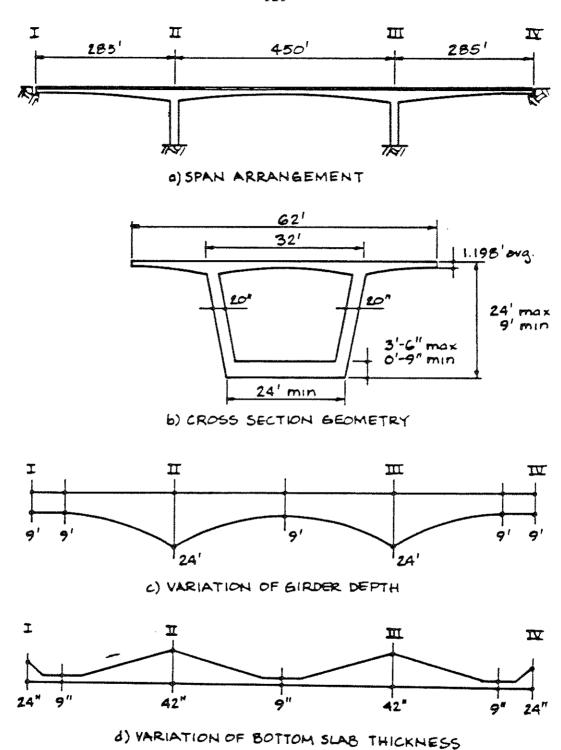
THREE SPAN CANTILEVER CONSTRUCTION BRIDGE Ketchum [27]
